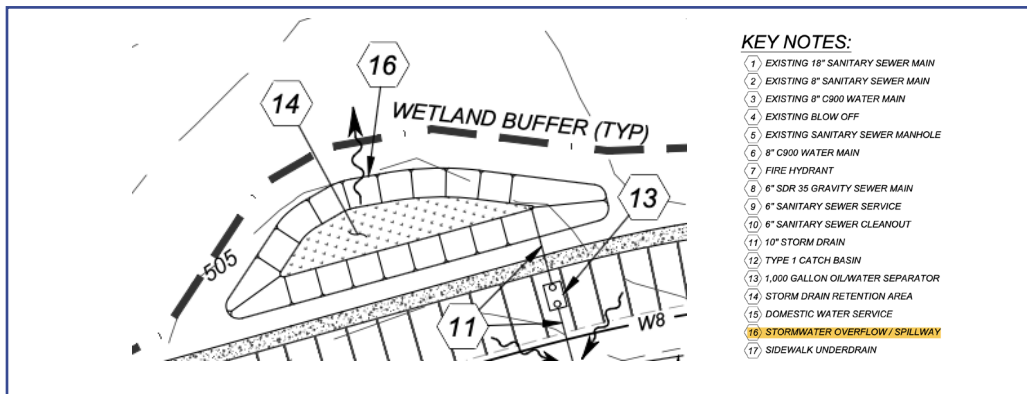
Detail of stormwater infiltration pond and explanatory notes from Stormwater Plan. Note that note 16 clearly labels the wavy arrow directed towards the wetland buffer as “stormwater overflow”.
